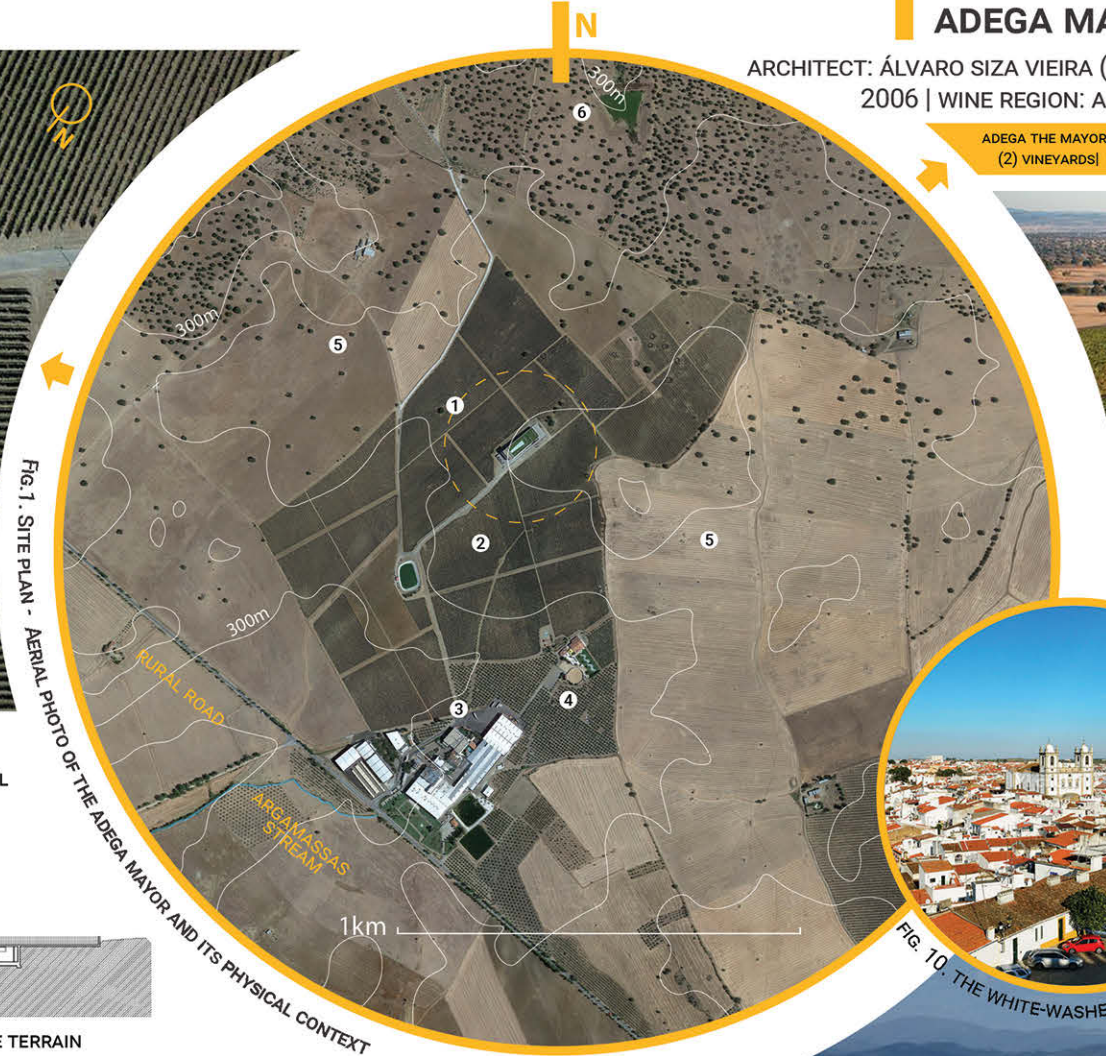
SITE PLAN - AERIAL PHOTO OF THE ADEGA MAYOR AND ITS PHYSICAL CONTEXT
